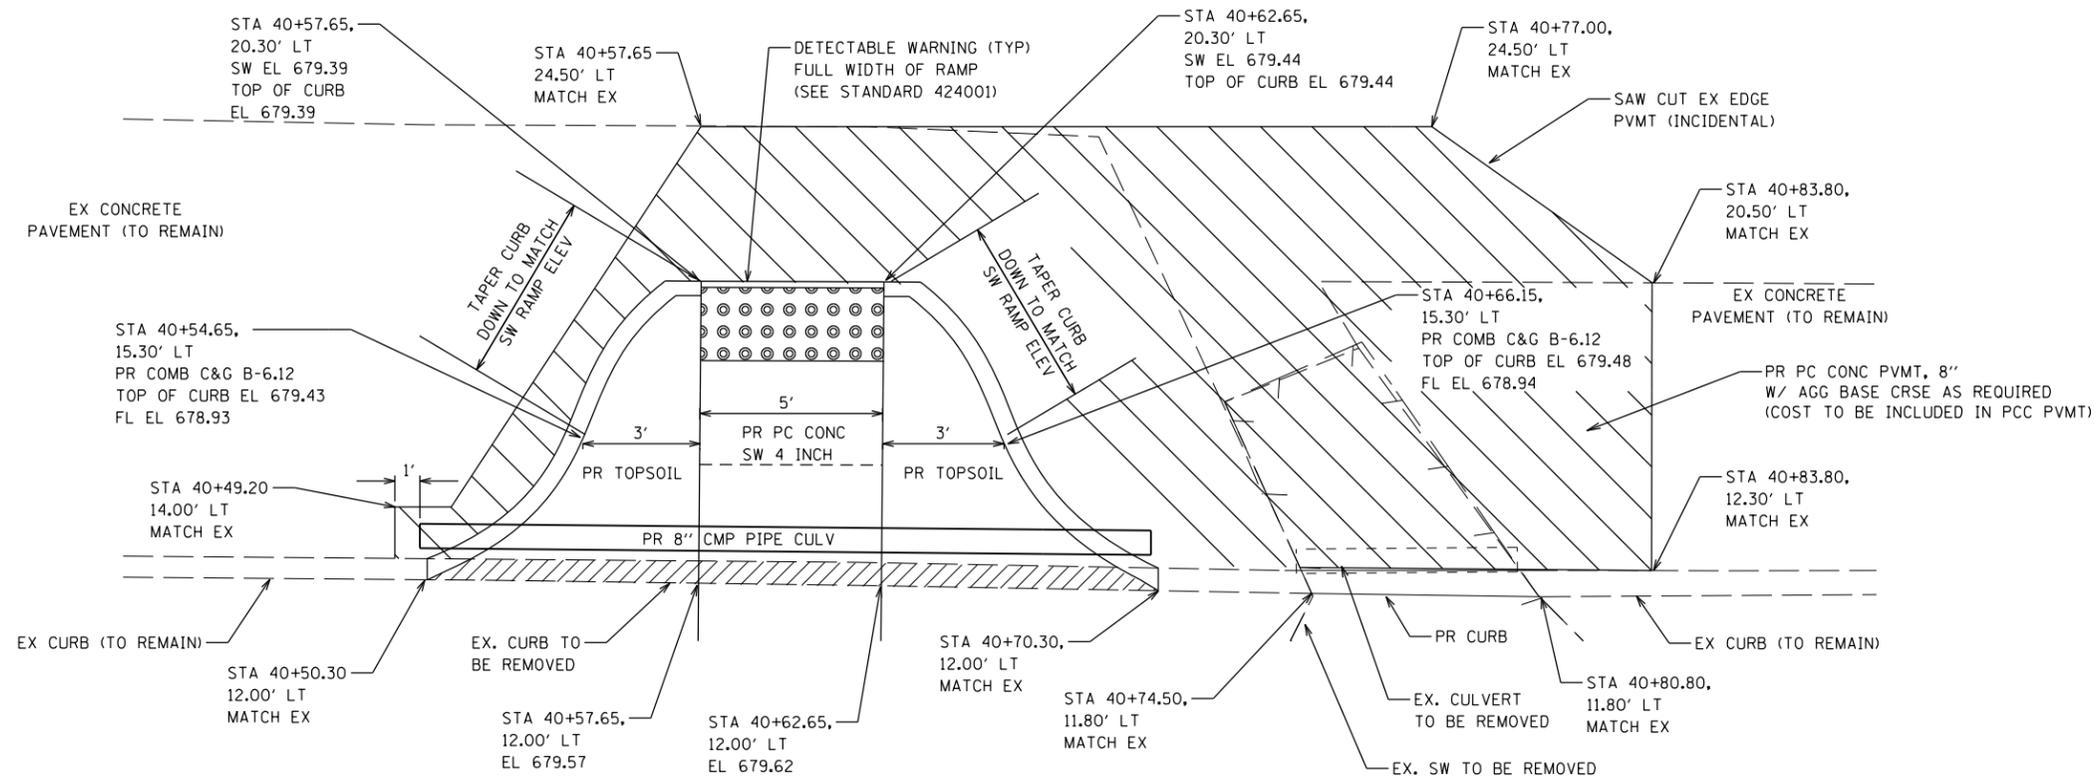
DETAIL SIDEWALK END ABUTTING EXISTING PAVEMENT
